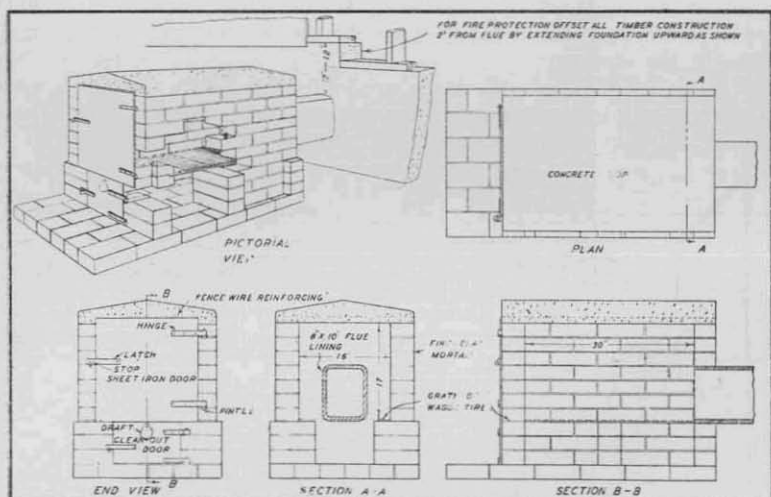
Construction details for the type of underground furnace to be fired from the end.
